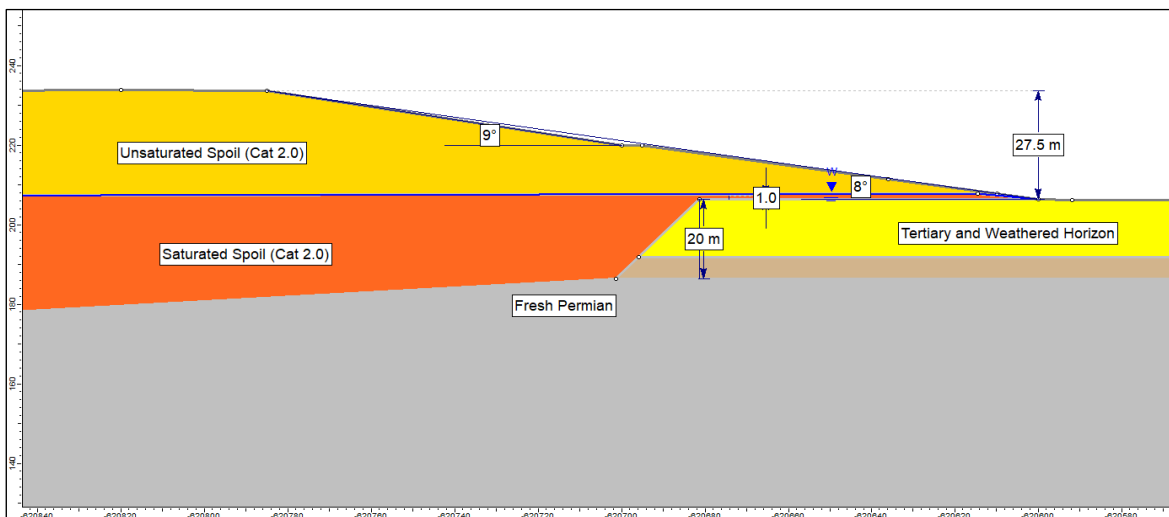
Northern In-Pit Spoil Dump - Section 3 (South Facing)
